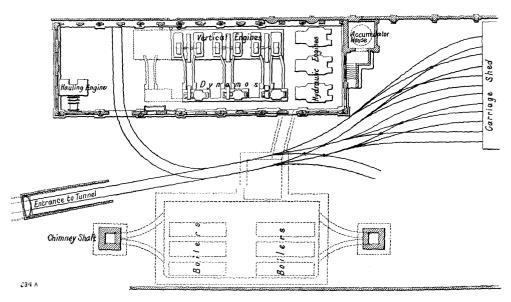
PLAN OF POWER HOUSE OF CITY AND SOUTH LONDON RAILWAY.
